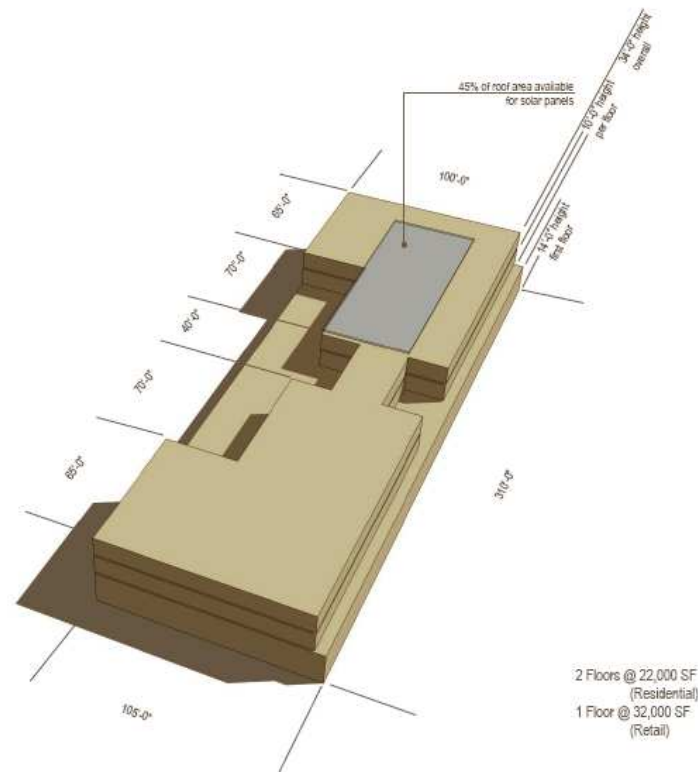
Retail/Residential Mixed-Use Low-Rise Building
